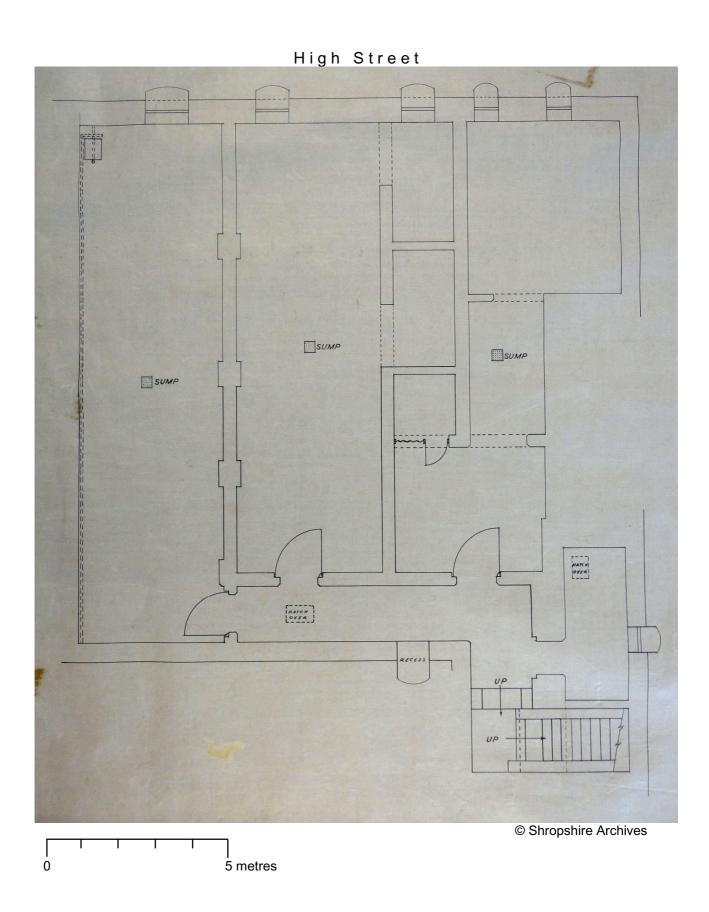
Extract from the 1956 plan of the Whitchurch Town Hall cellars (SA Ref DA15/701/29
